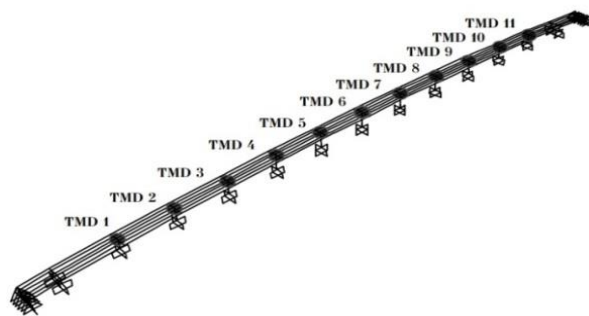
Computer model of the College Bridge and mass dampers mounted on the bridge
